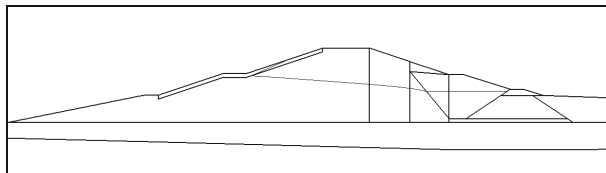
Variant 2 Material zones scheme – location of the insulation at upstream slope, within zone of concrete panels
